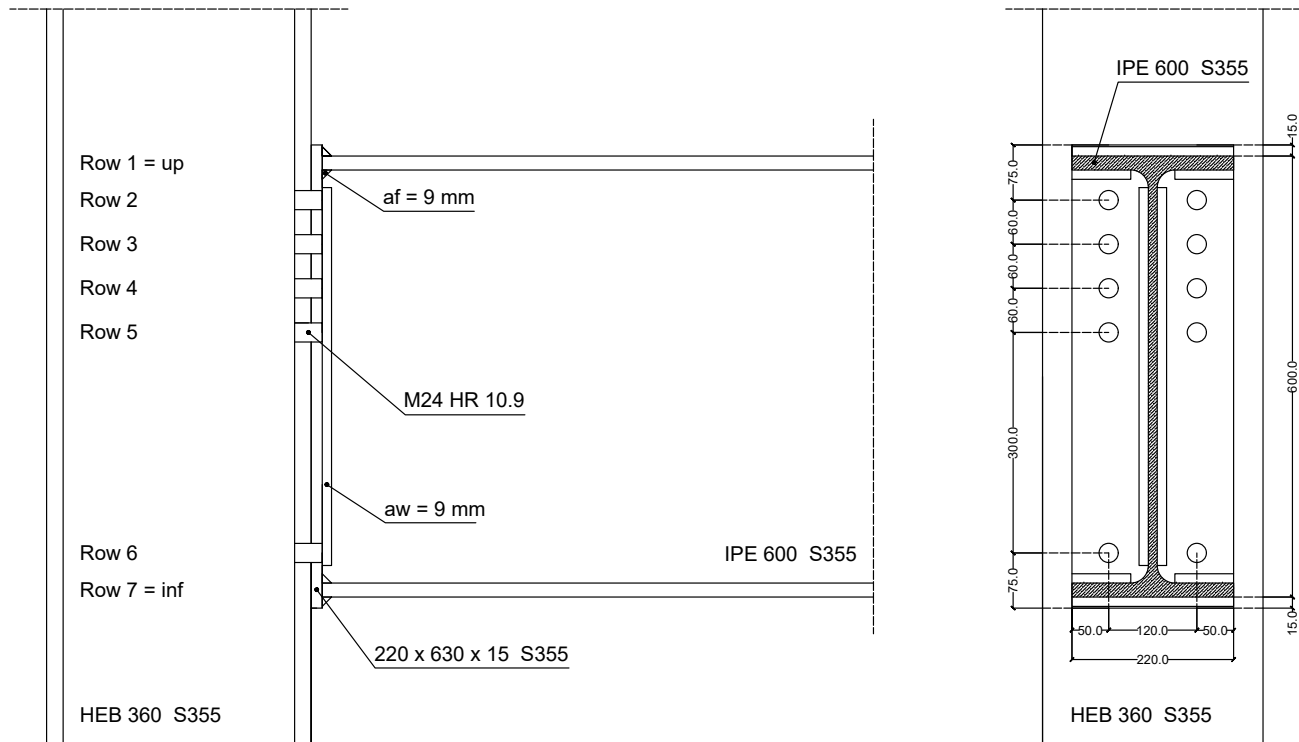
FAILNOMORE - Joint configuration C2 - Technical drawing
